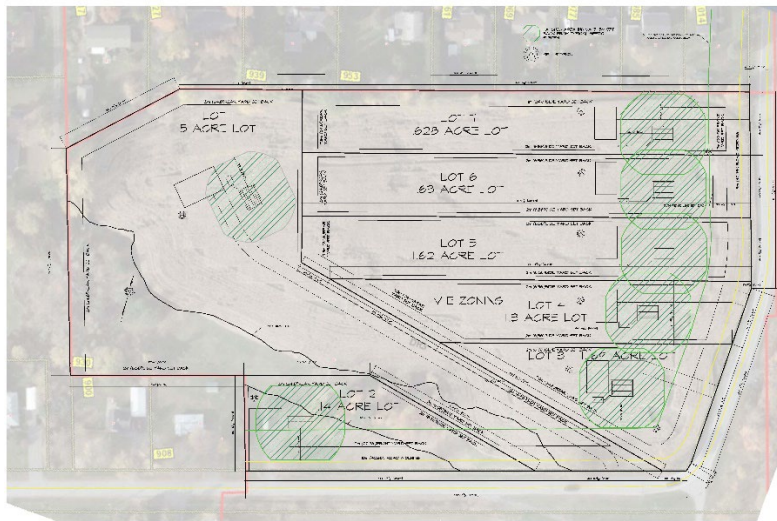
Extract of Site Plan – Overlay on the Farm
